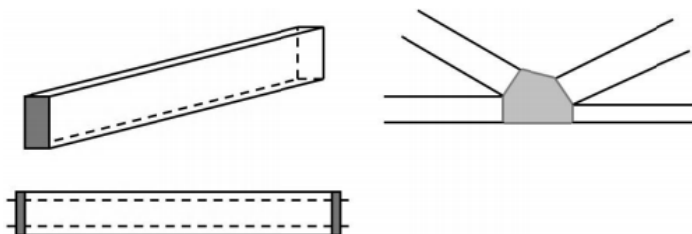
Connections of truss elements with POT strads. [B04, p623]
